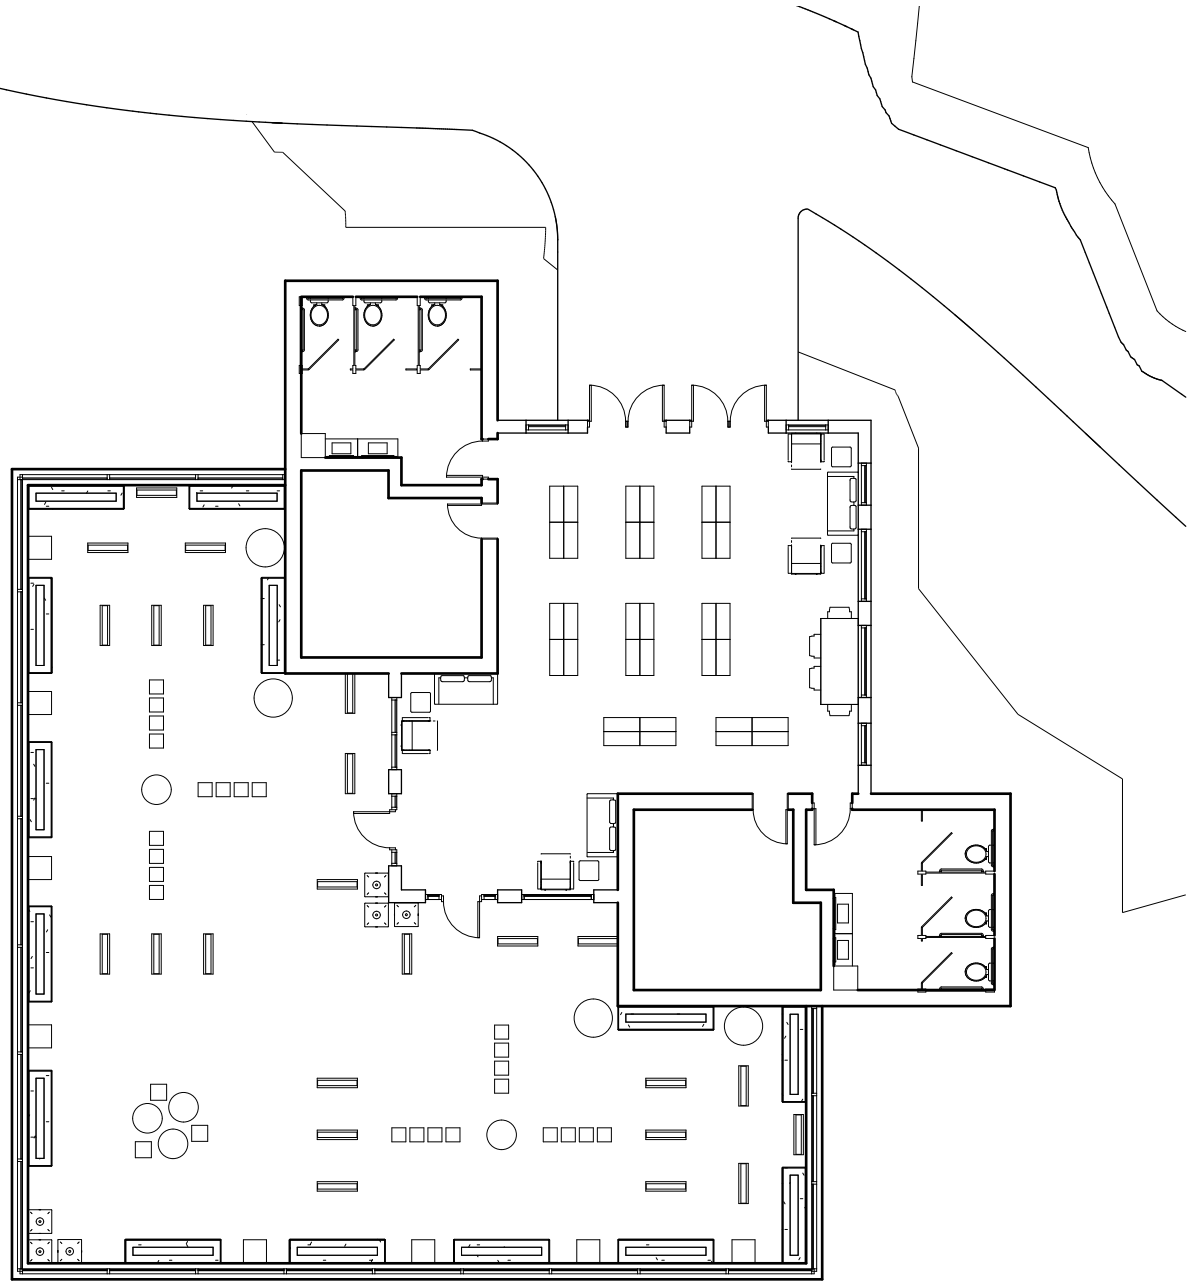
LIBRARY & GREENHOUSE FLOOR PLAN
